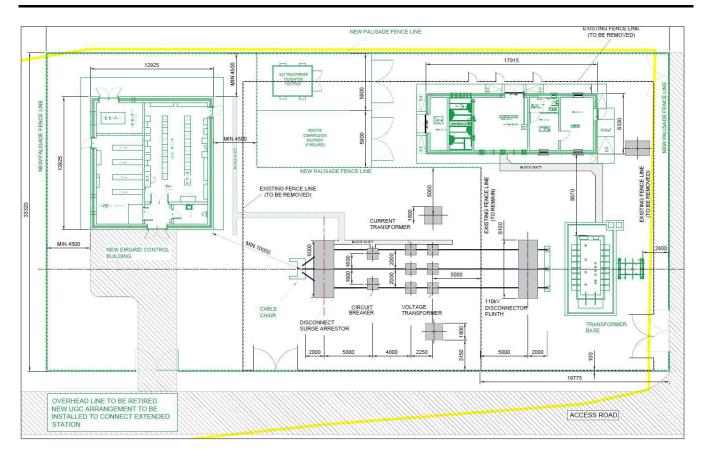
Golagh 110kV Substation - Proposed New Layout
